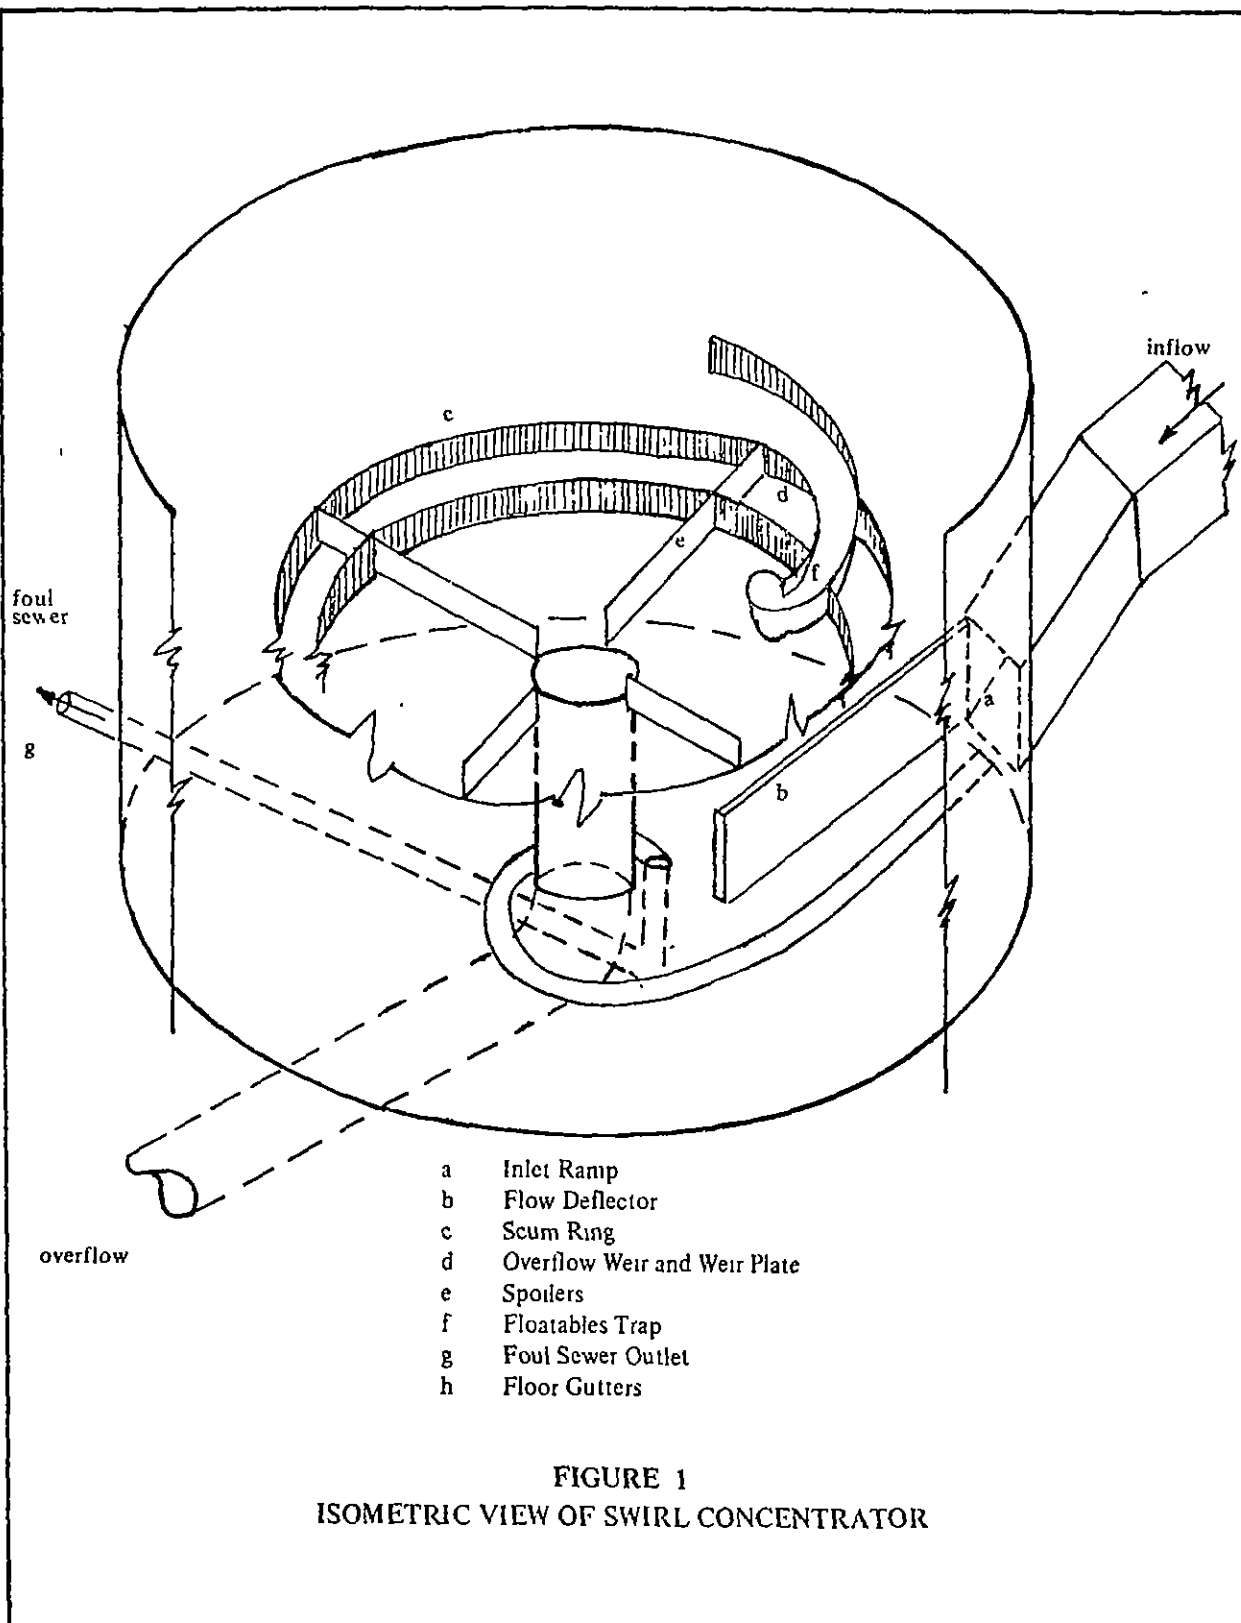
, Isometric View of Swirl Concentrator, depicts the final hydraulic model layout showing details such as the floatables trap, foul outlet and floor gutters.
